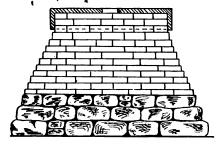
SHOWING PLAN OF ANOTHER ENGINE FOUNDATION.
